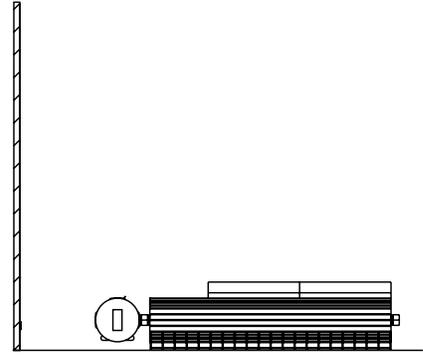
FLOOR MOUNTING DIAGRAM
